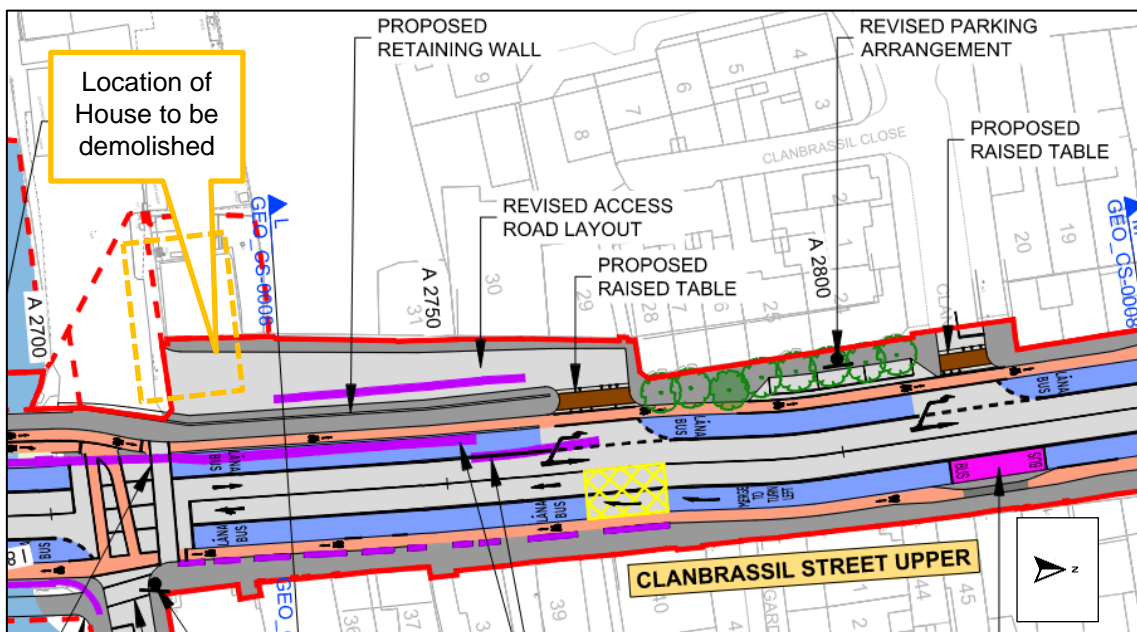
Proposed Scheme Layout at Clanbrassil Street Upper southern section
